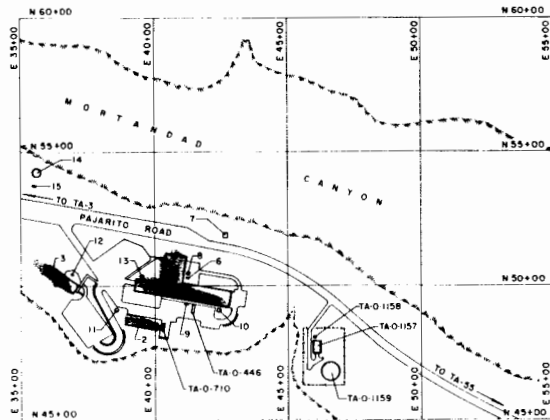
Structure Location Plan for TA-59 - OH Site
